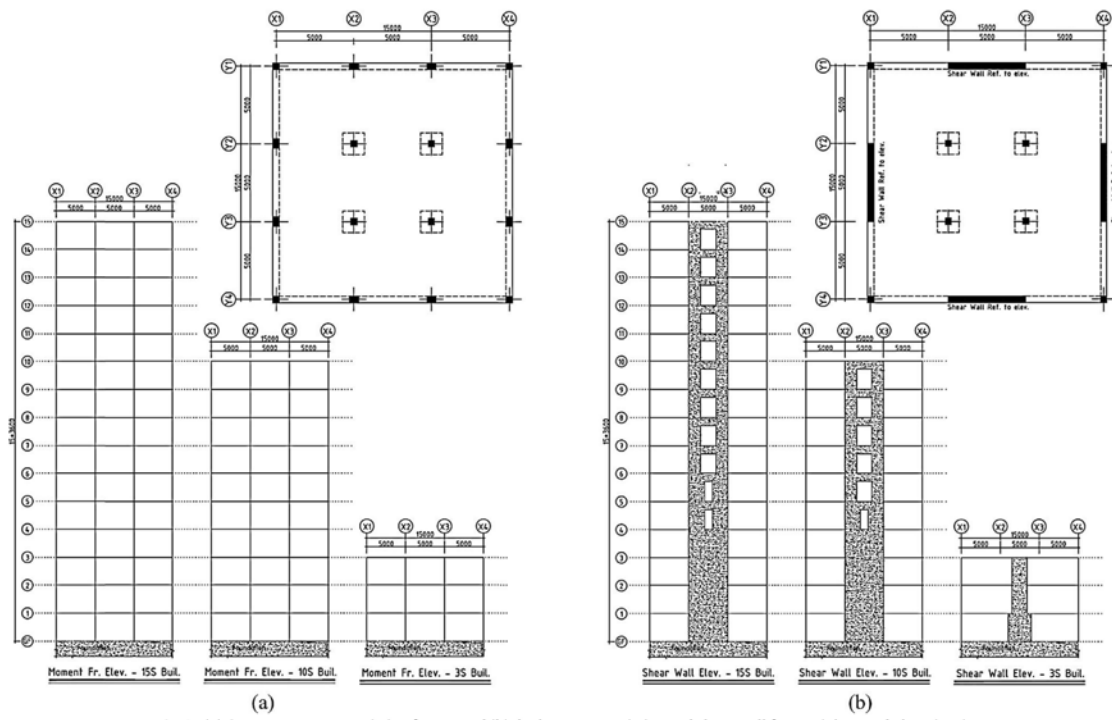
(a) Concrete moment resisting frames and (b) dual moment resisting and shear wall frames (plans and elevations).
